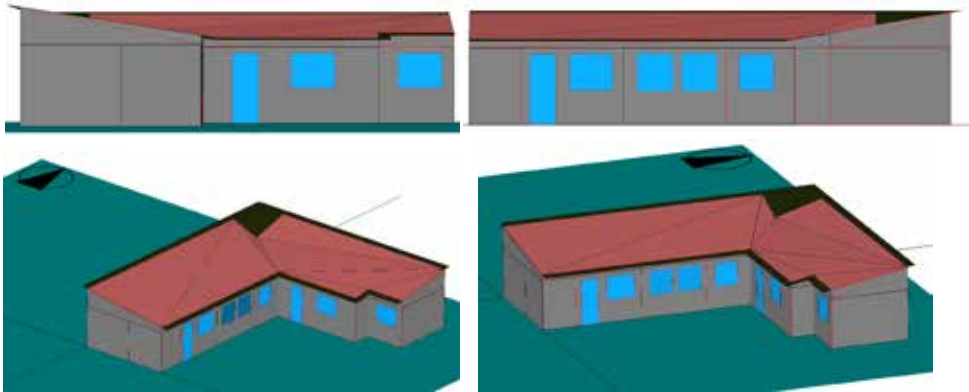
Views of the residential house prepared in HULC (Source: M.R.de Adana's private archive)
